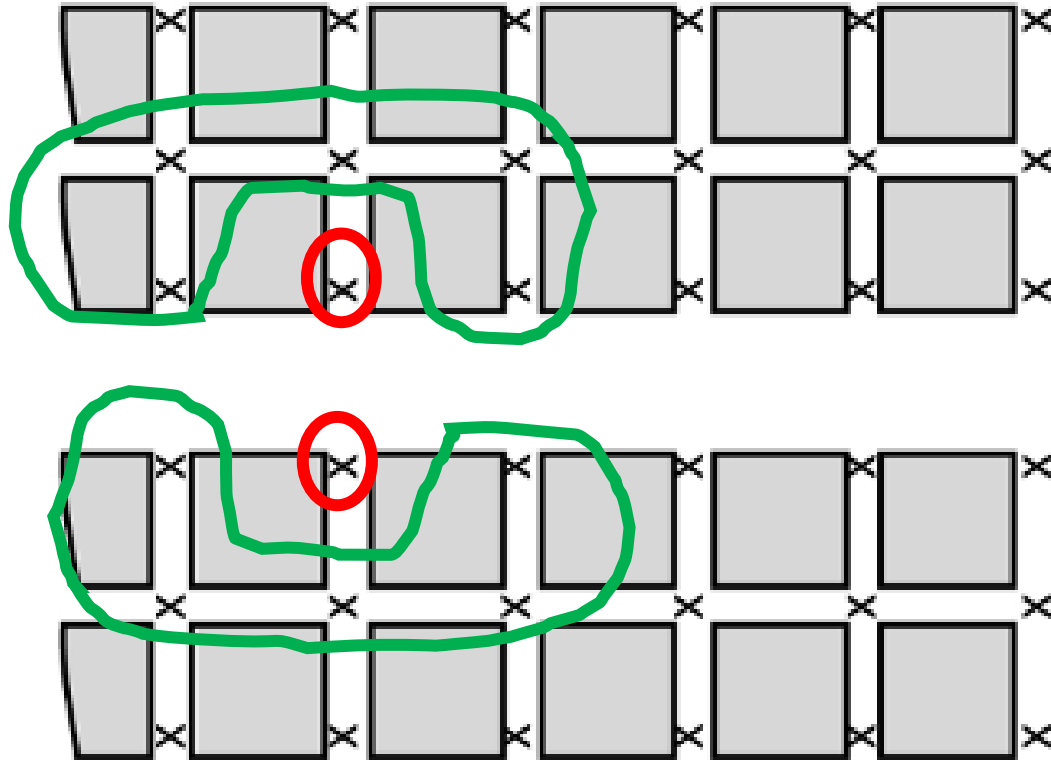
(f) Plan View of In-Rack Sprinkler Arrangement for Open Multiple-Row Racks.
